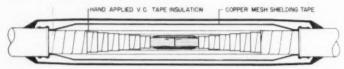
Straight joint for single-conductor, 8000 volts and higher, paperor varnished-cambric-insulated, lead-covered cable.
